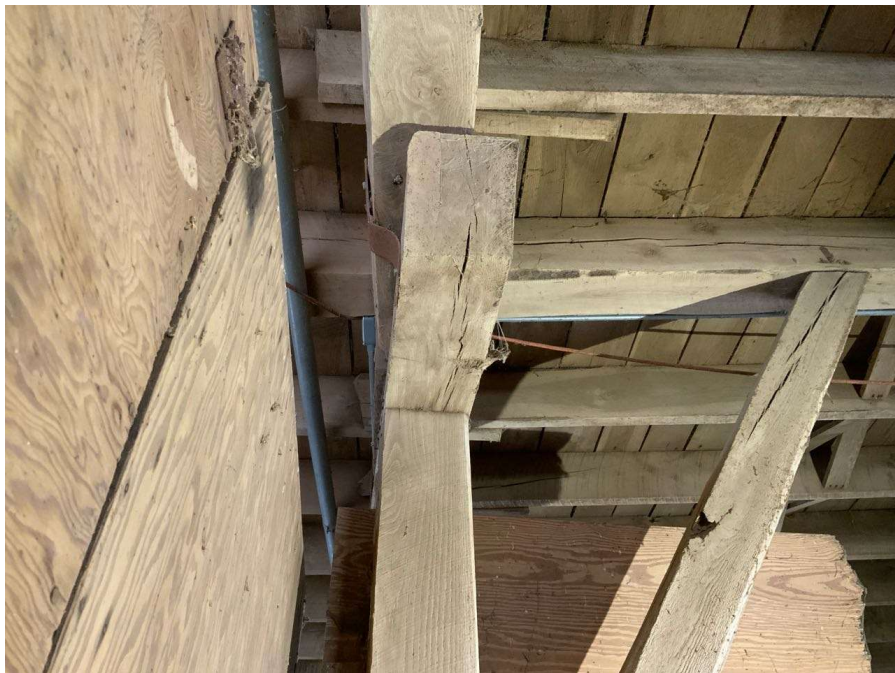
Column C/2 cap is twisting causing bearing loss of the hayloft floor beams (looking east).
